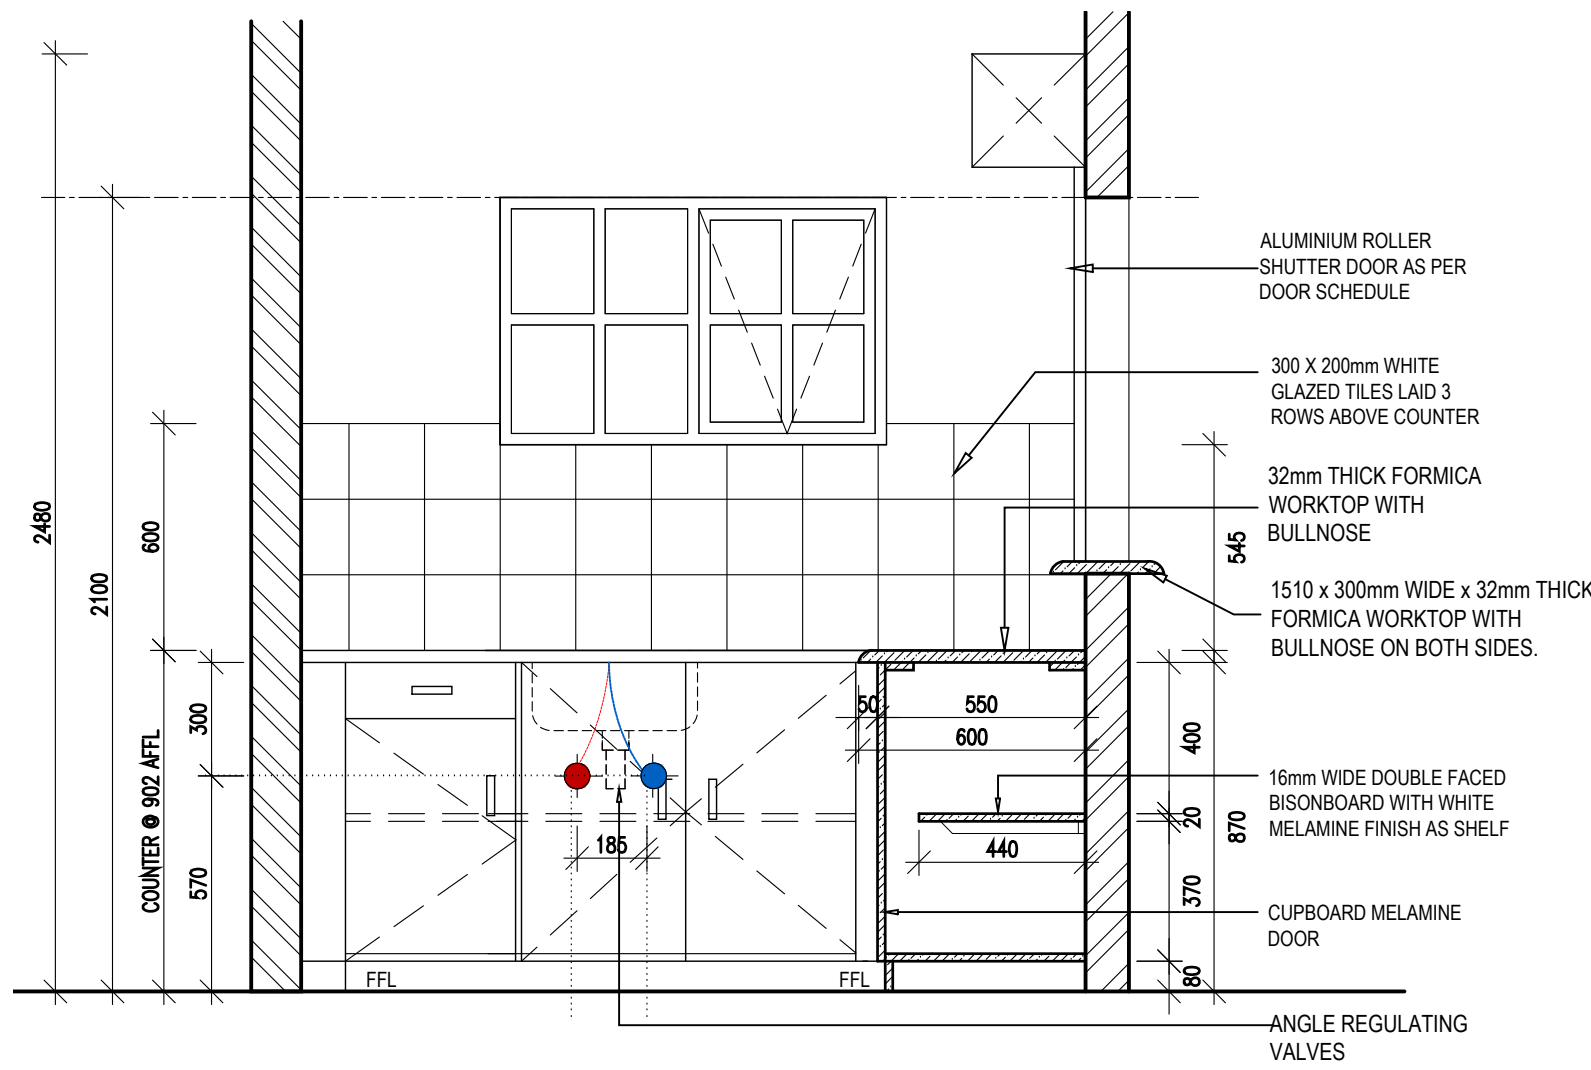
STAFF KITCHEN-SECTIONAL ELEVATION A
